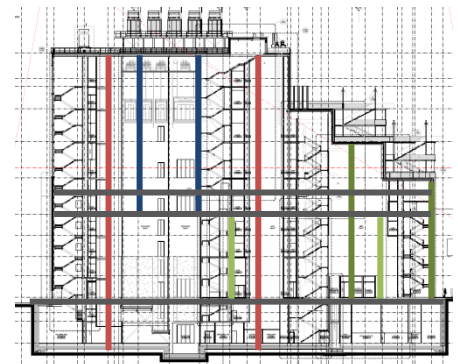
Section cut showing N-S braced frames at staggered heights (A-212)
